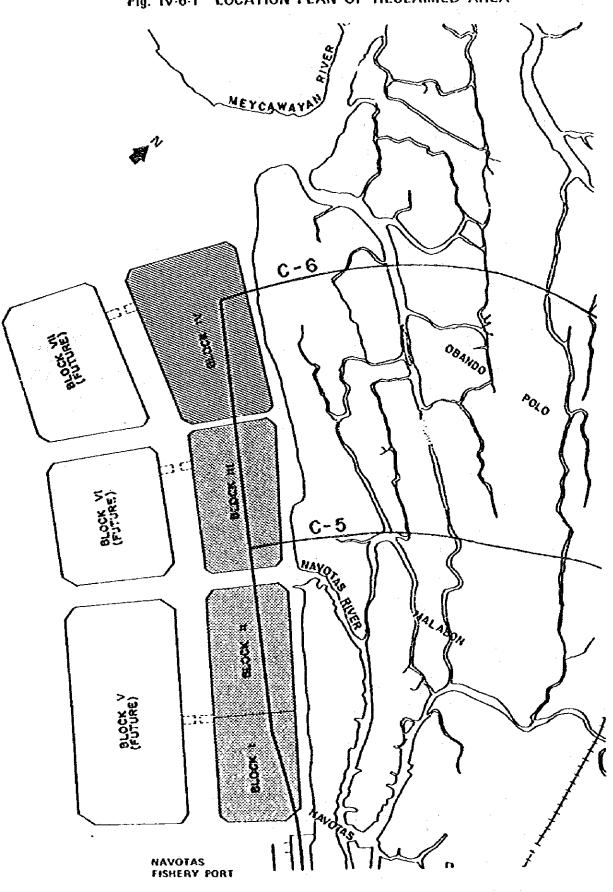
LOCATION PLAN OF RECLAIMED AREA
